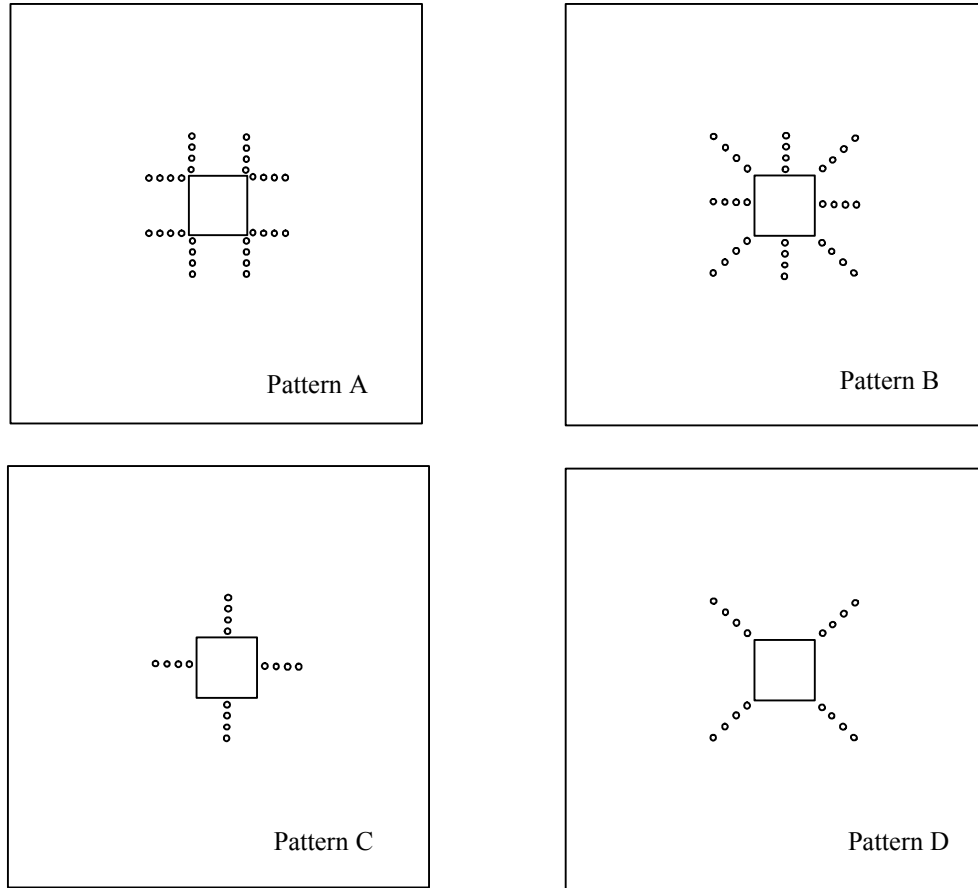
Possible Shear Reinforcement Patterns (Plan View)
